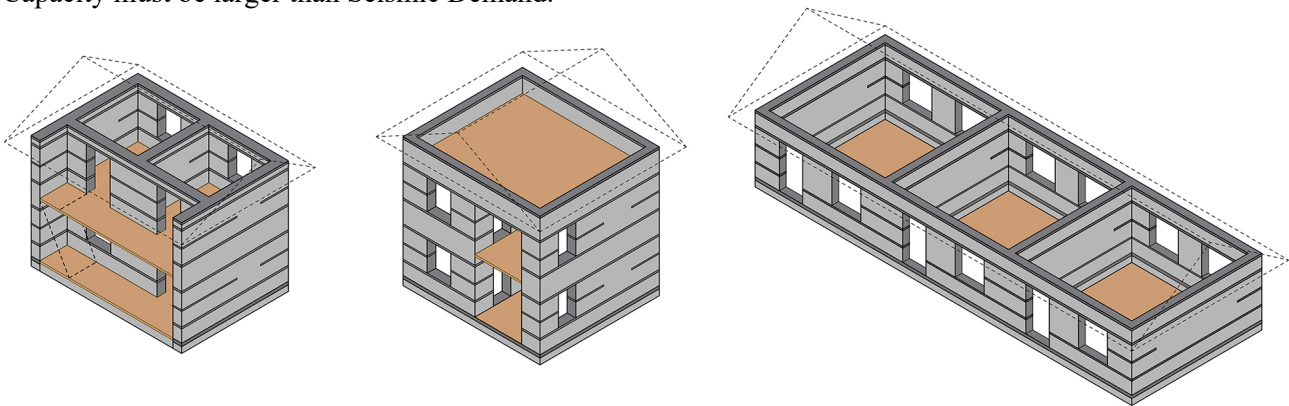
Case study buildings as proposed in Nepal, being a) two-story slender house, b) two-story plus attic stocky house and c) three-classroom school building (by courtesy of Smart Shelter Foundation).
